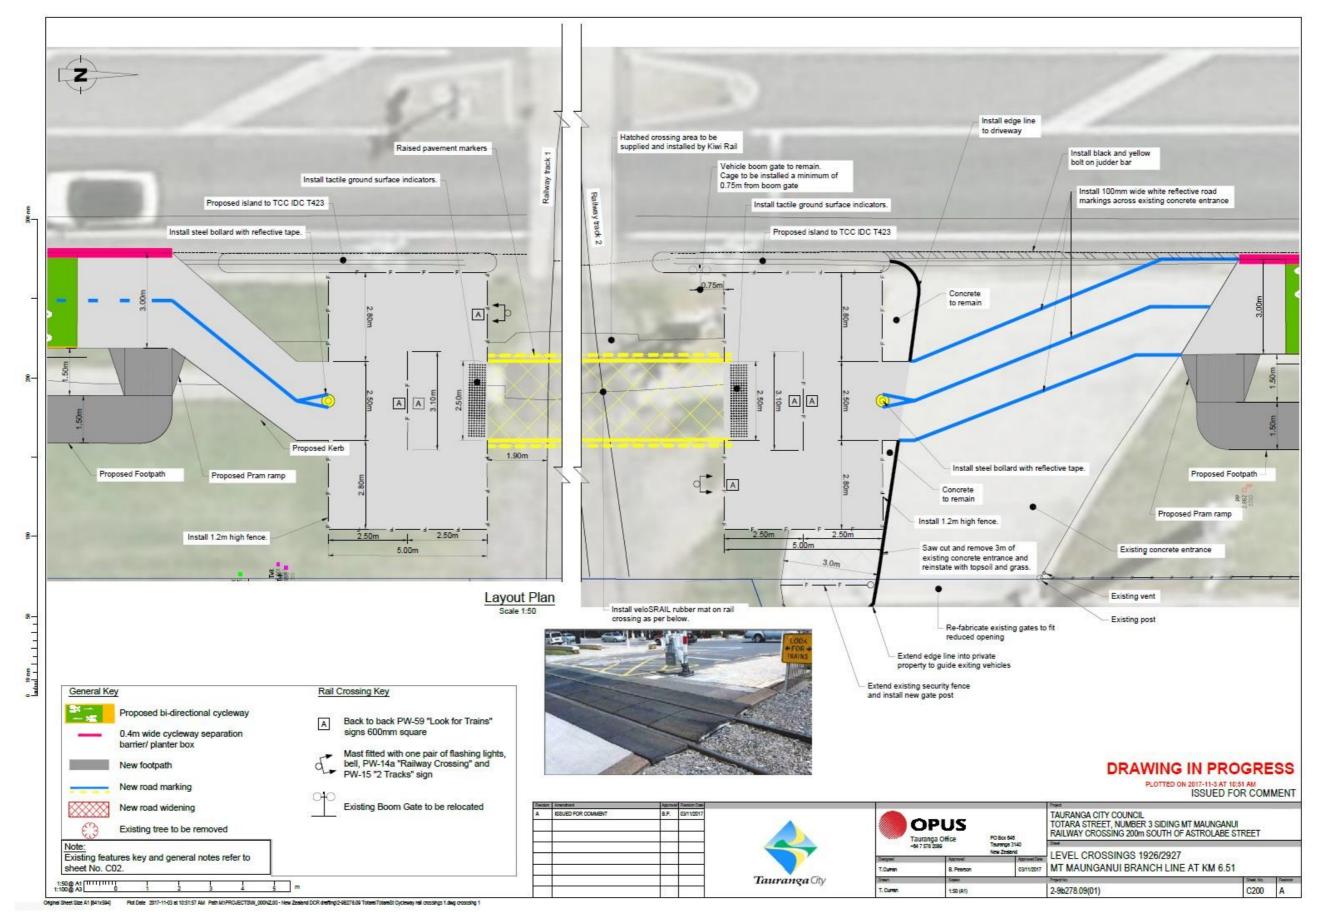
Proposed Design for Pedestrian Crossing 1927, Mt Maunganui Branch Line KM 6.51, south of Astrolabe Street
